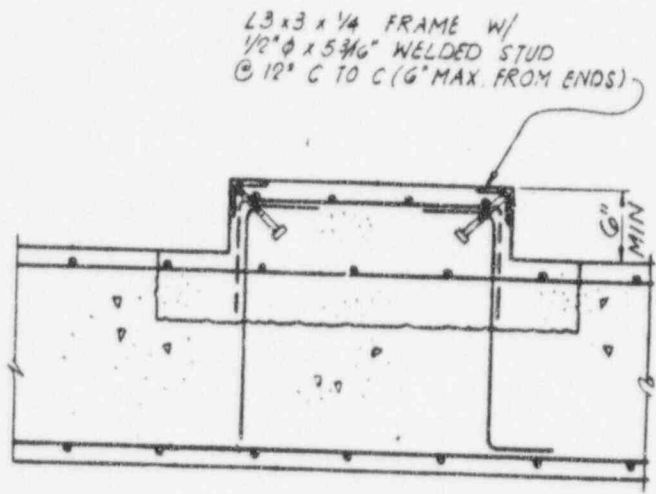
Typical Electrical Equipment Pad and Embedded Member, and Reinforcing Details
